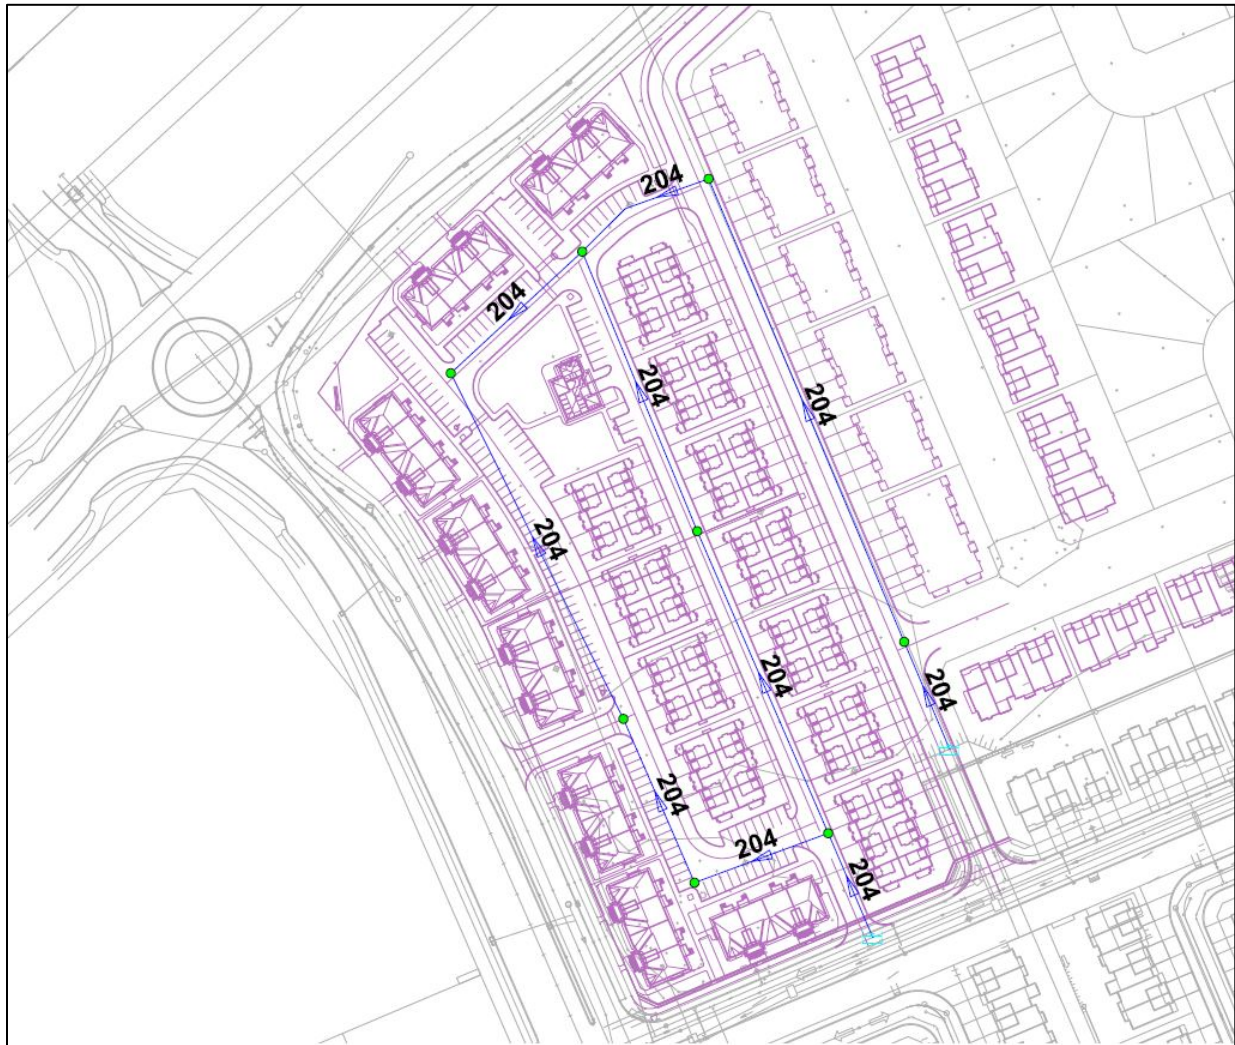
Proposed Watermain Layout and Pipe Diameters (mm)
